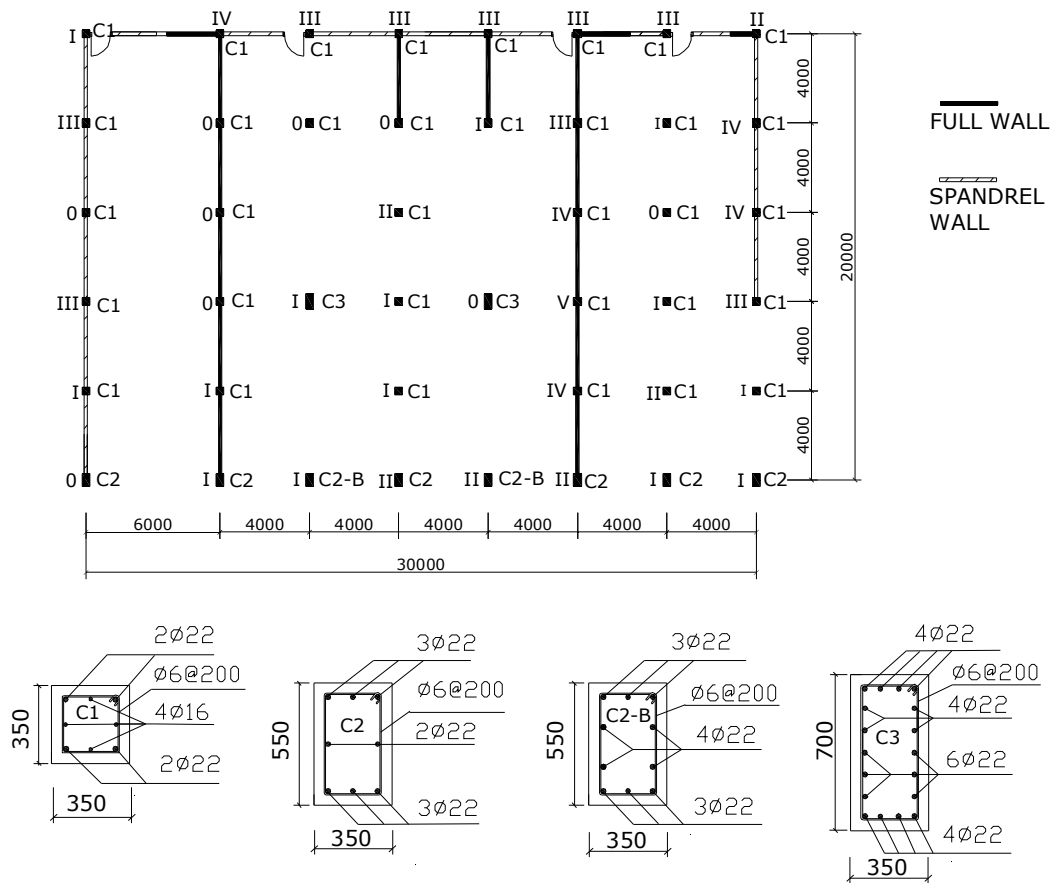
First floor plan of surviving building and damage class of each column.
